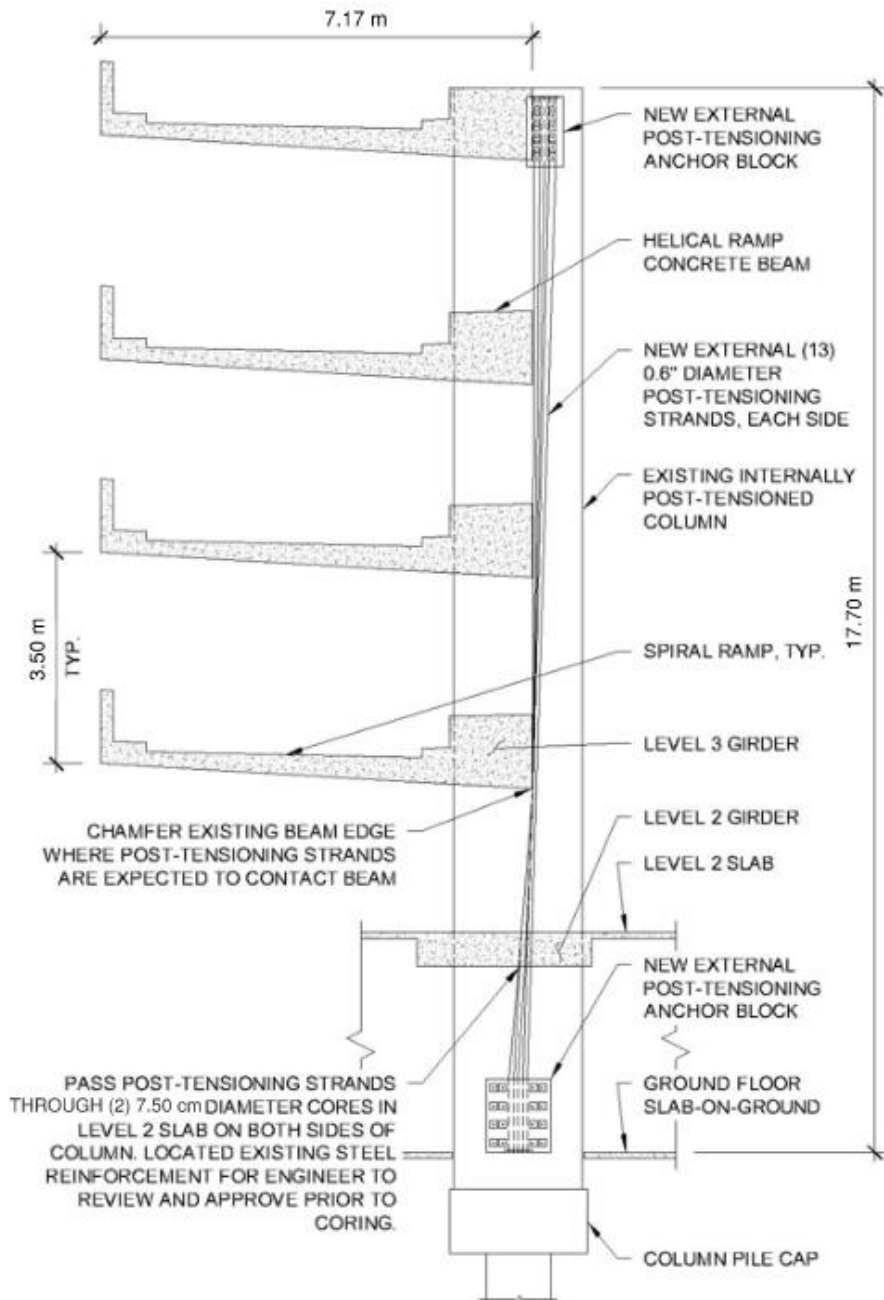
Elevation of the vertical external post-tensioning strengthening of a cantilever column
